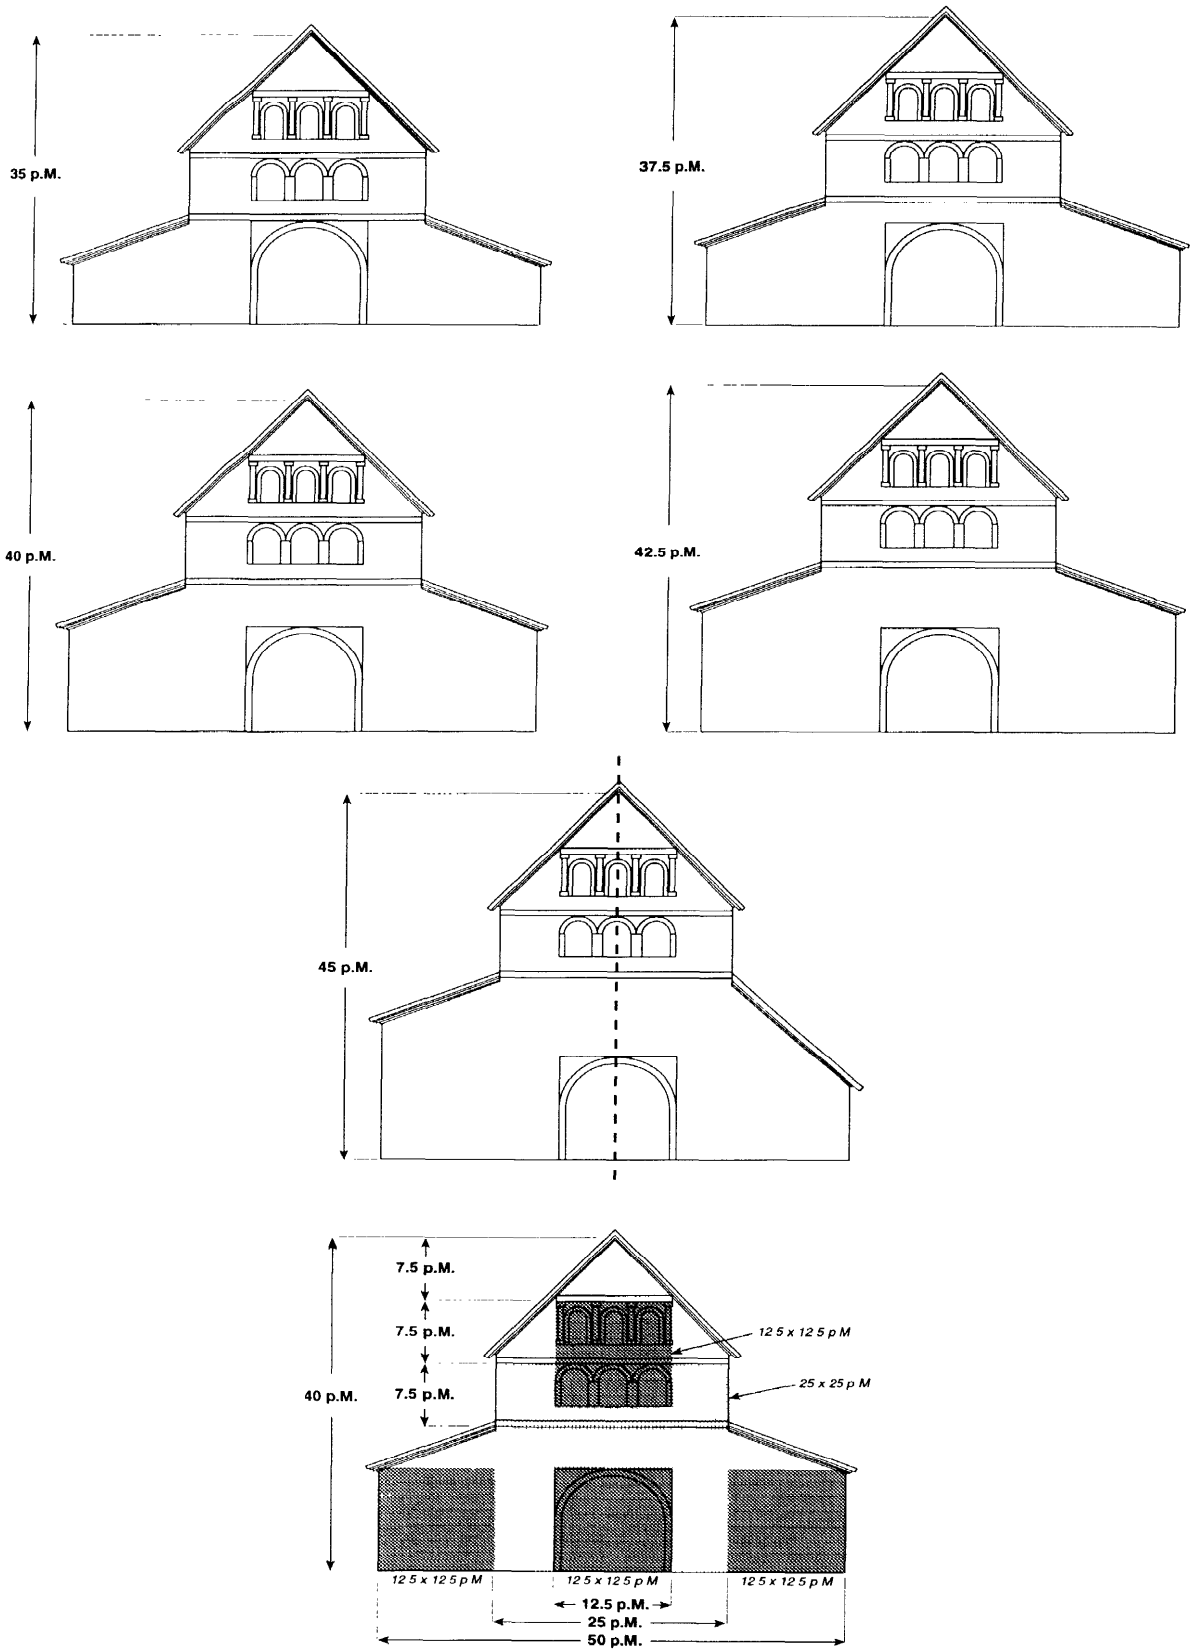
Meonstoke: alternative heights for the façade, in Roman feet (pedes Monetales). Bottom: basic modules used in the layout of the façade
